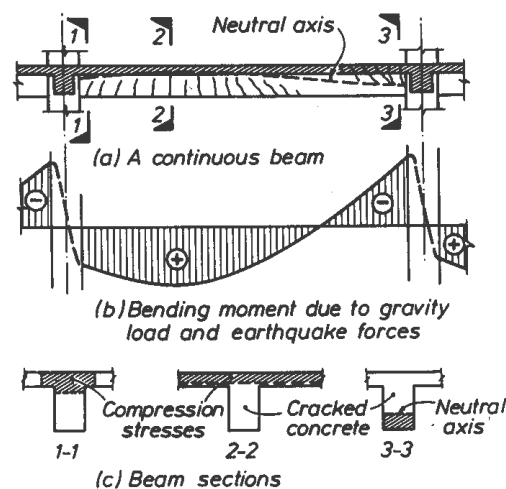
Variation of sectional properties along the span of a beam (Paulay and Priestley, 1992)
